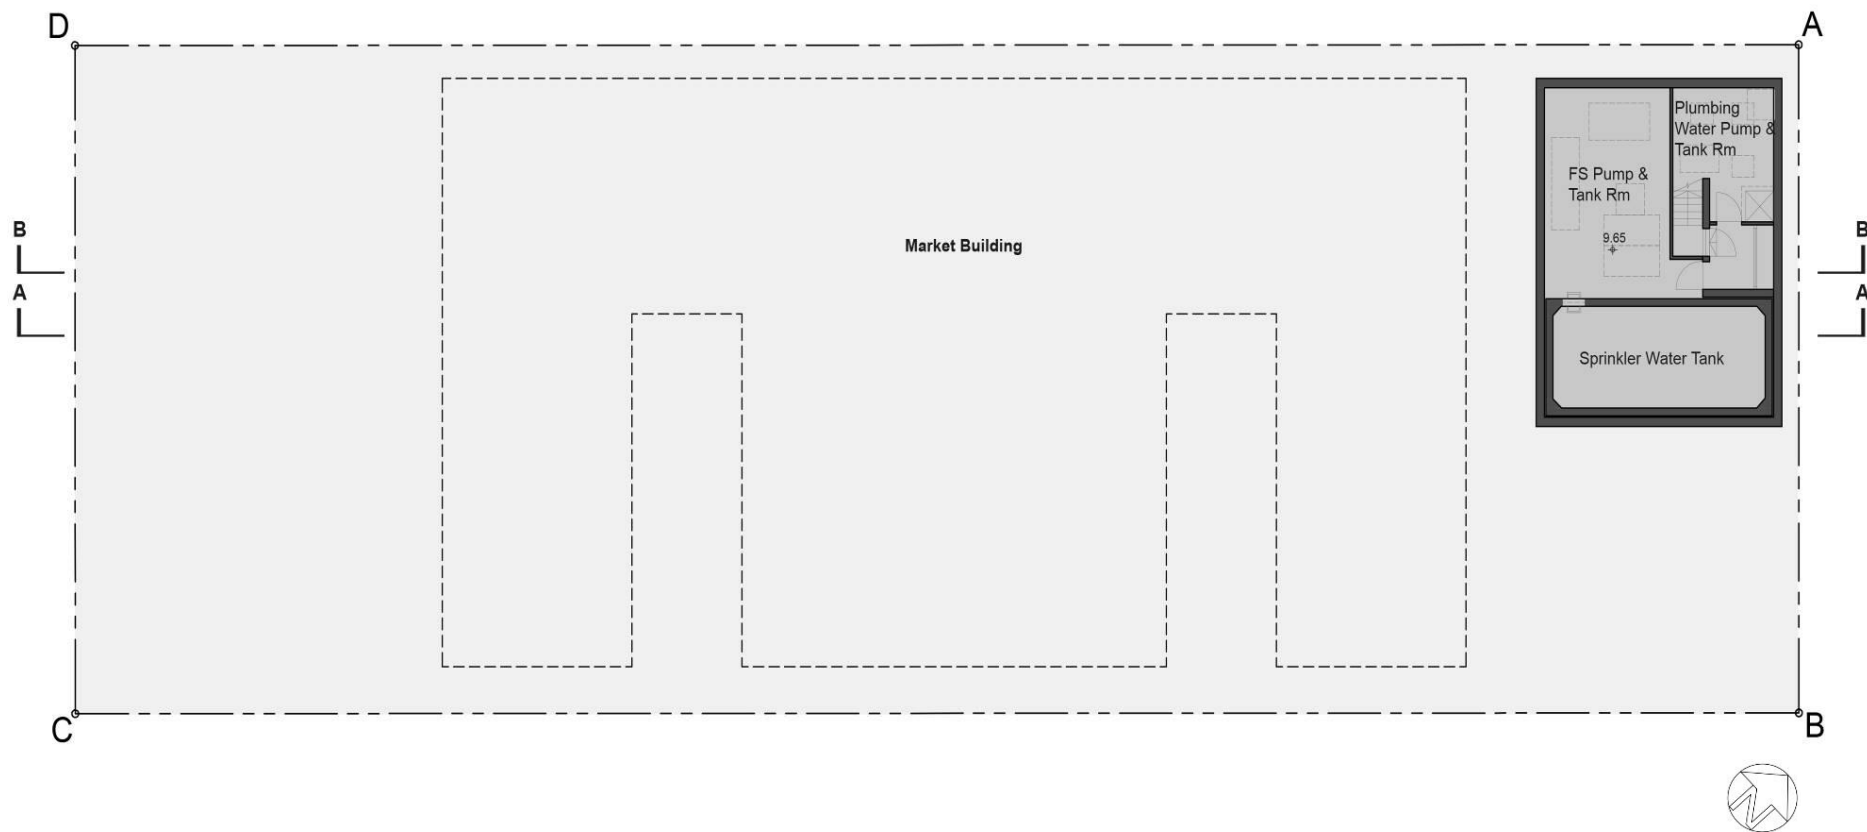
Proposed basement floor plan of the new annex block (not to scale).
